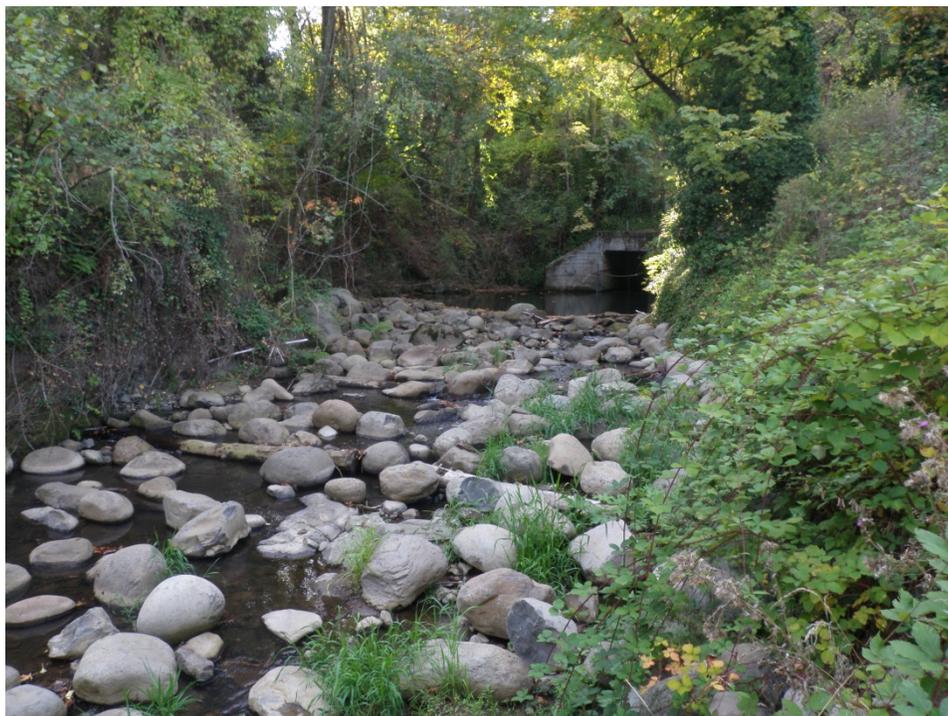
Highway 43 Culvert on Tryon Creek (facing upstream)
